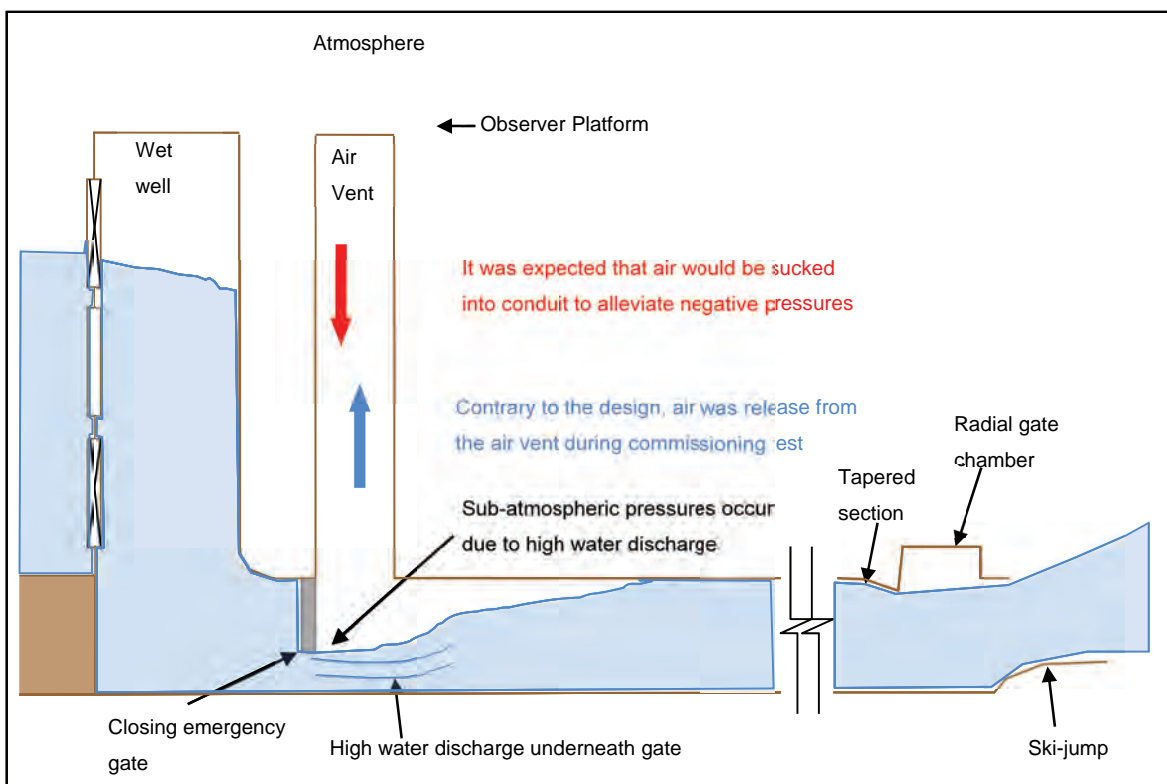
Cross-section of Berg River Dam intake tower (a) and outlet structure (b)
